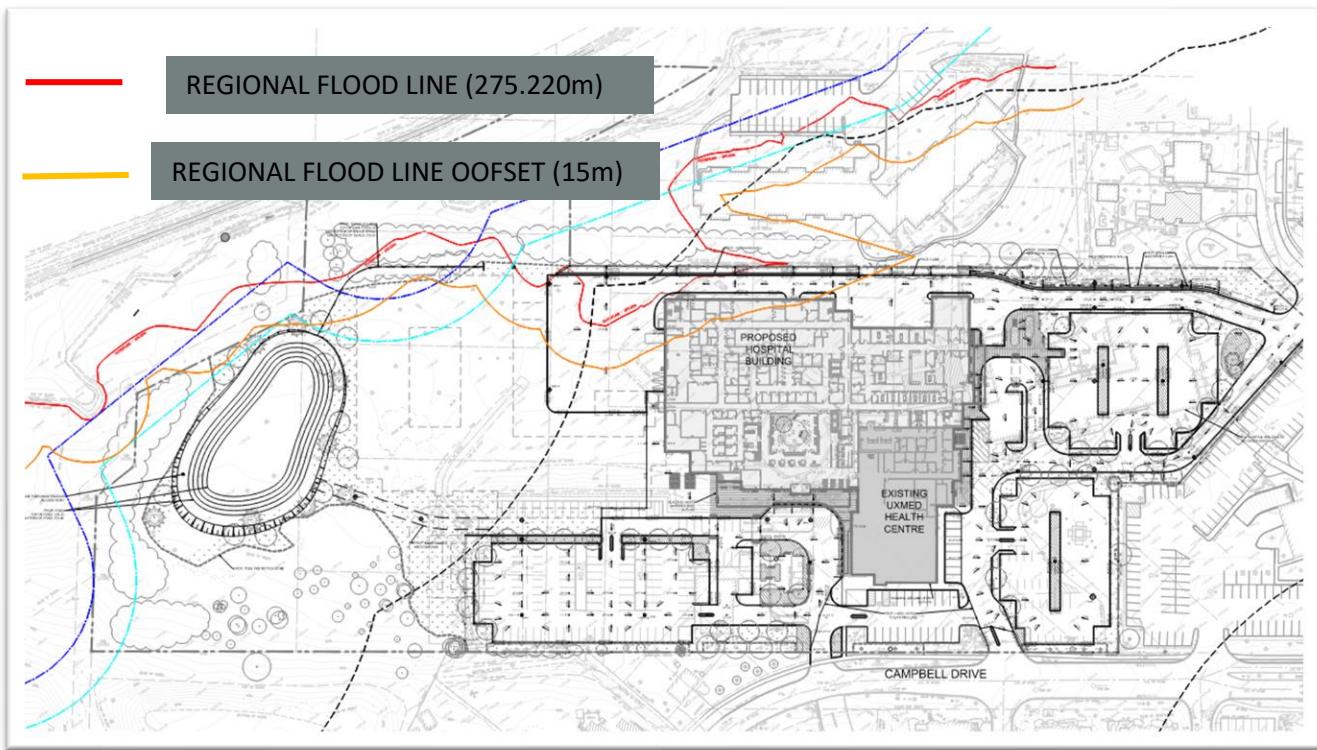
Proposed Site and Existing Regional Flood Plain elevations for Uxbridge Brook
